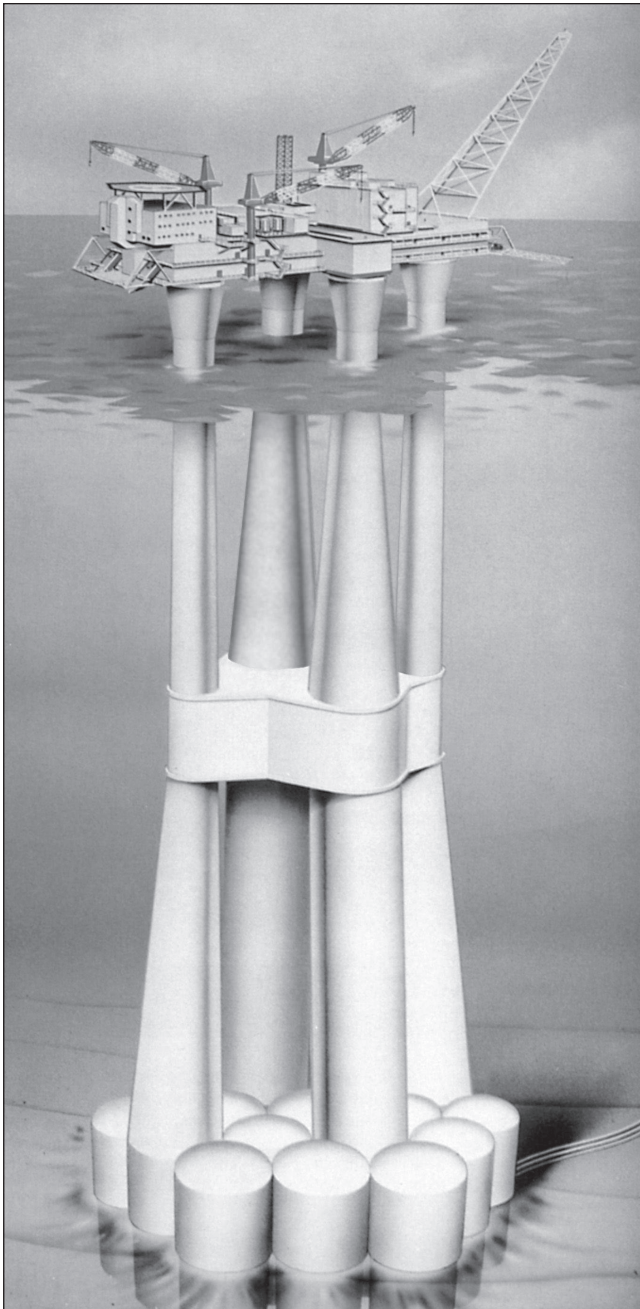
Concrete gravity structure. (Courtesy Norske Shell.)
